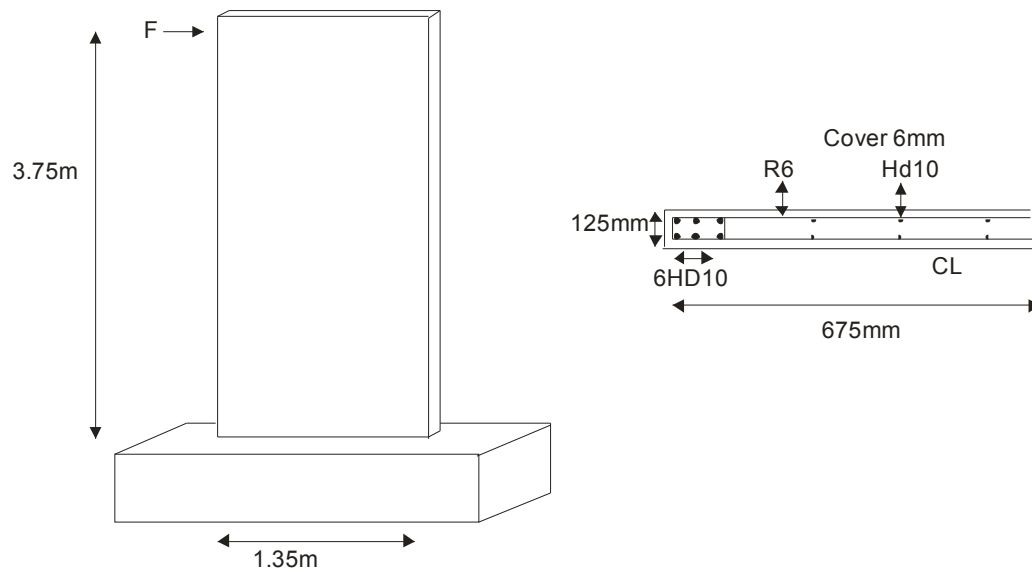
Wall geometry and reinforcing details for Holden wall
